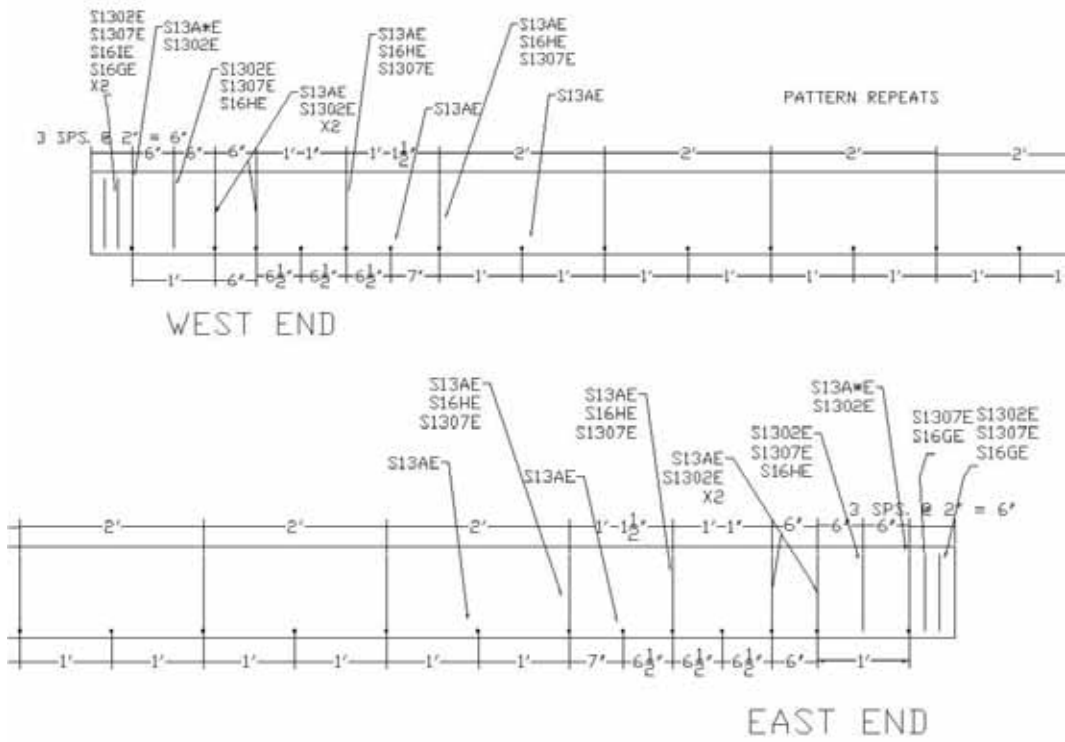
As-built reinforcement layout of Beam 1S (elevation view)
